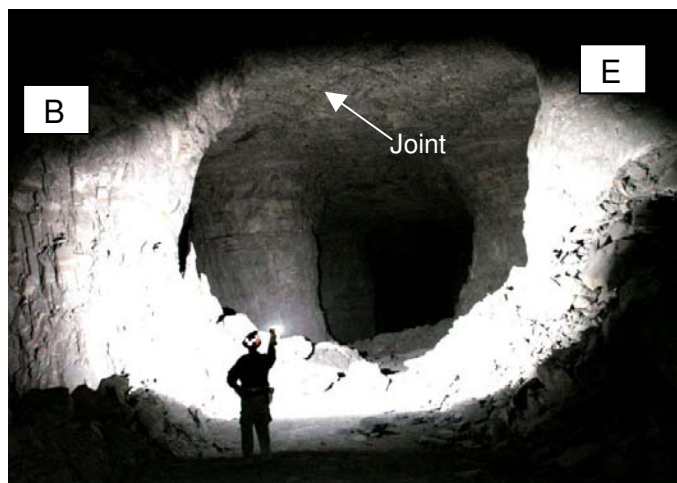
View of pillars showing slabbing and rubble from rib failure, Pillar B on left and Pillar E on right in photograph.
